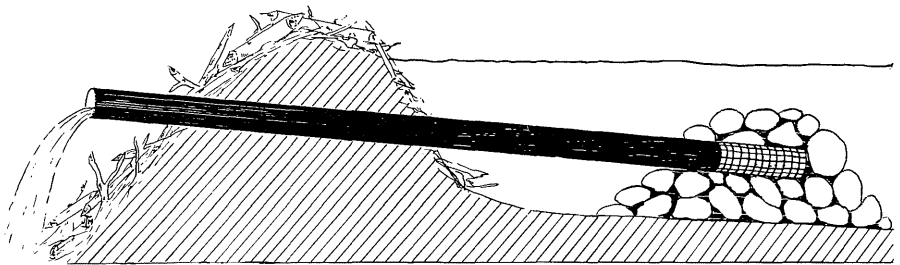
Use of pipe for controlling water level behind beaver dams. (Redrawn from Bailey, 1922)
